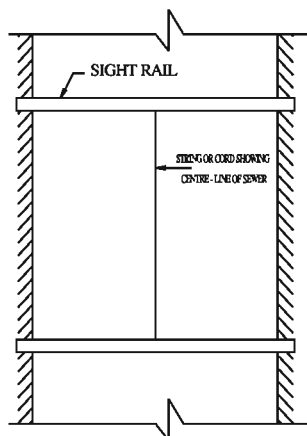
PLAN OF TRENCH FOR SEWER
